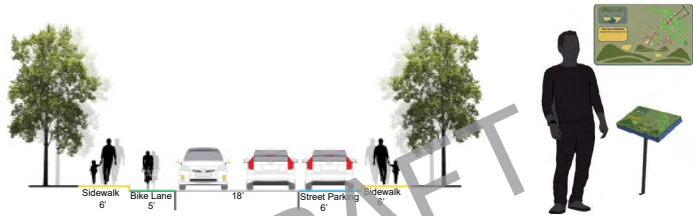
Section cut of the proposed complete streets featuring: dedicated bike lanes and street parking.
